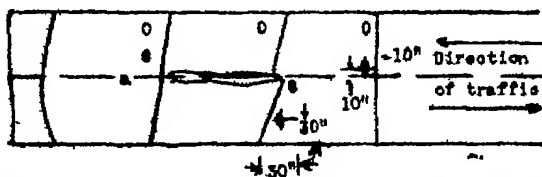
Typical location of void filling and lifting holes at transverse joints and cracks C, void filling hole : O lifting hole.
